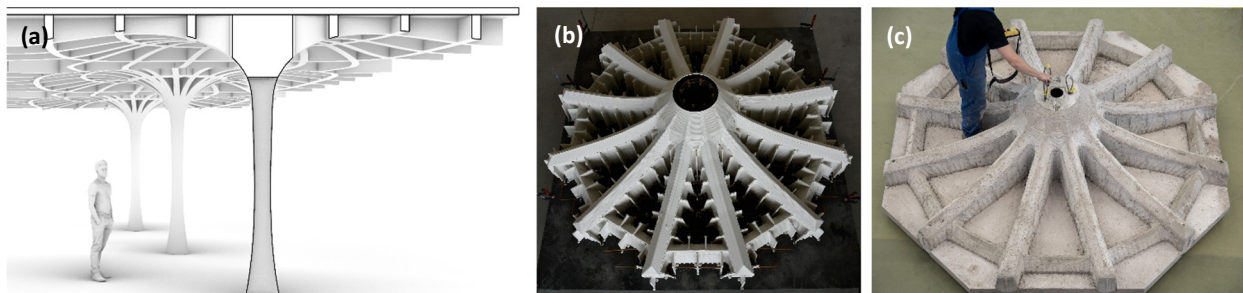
Ribbed slabs with thin polymeric 3D-printed formwork: (a) visualisation of the proposed slab system; (b) robotically 3D printed formwork; (c) finished optimised column-slab demonstrator.
